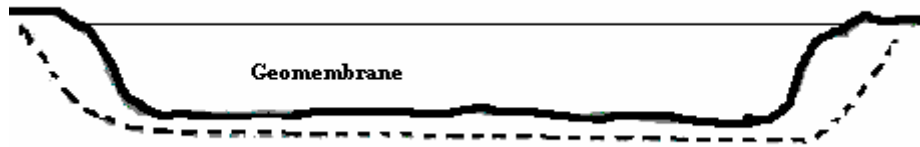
Geomembrane on the bed and banks and protected by geotextile
